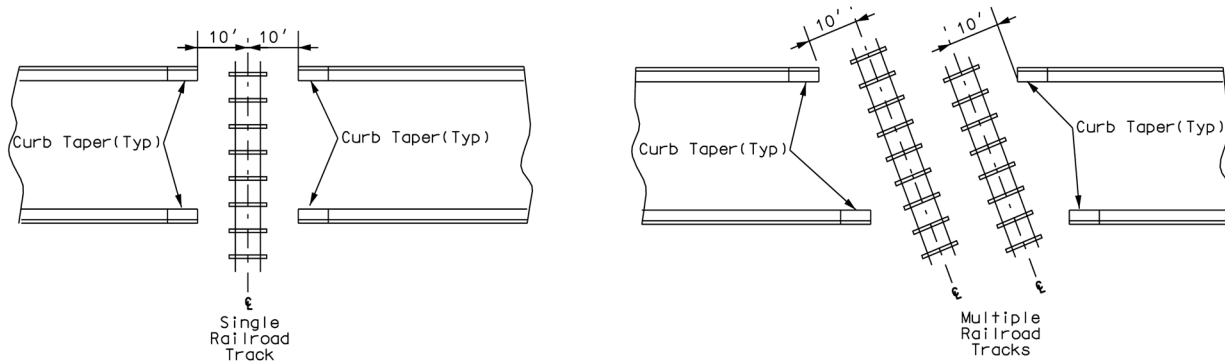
End of Curb and Gutter Adjacent to Railroad Tracks
